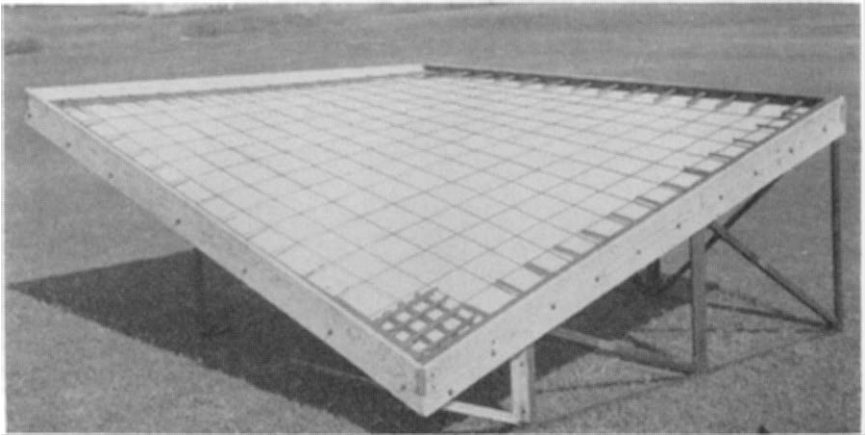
Installation of reinforcement for one quadrant of precast shell.
